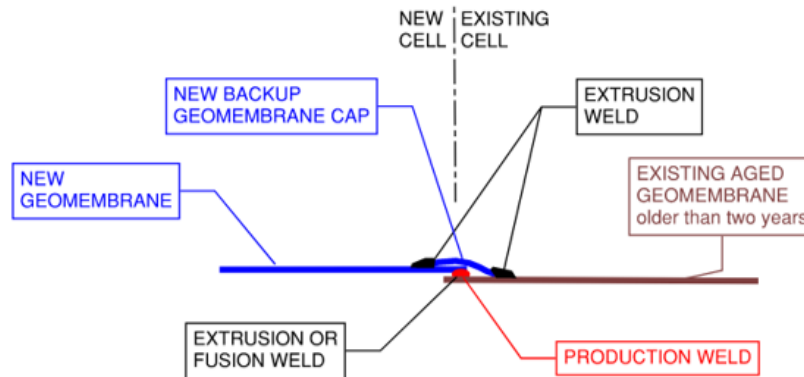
Location of Production Weld in Tie-in Seams to Existing Geomembrane
